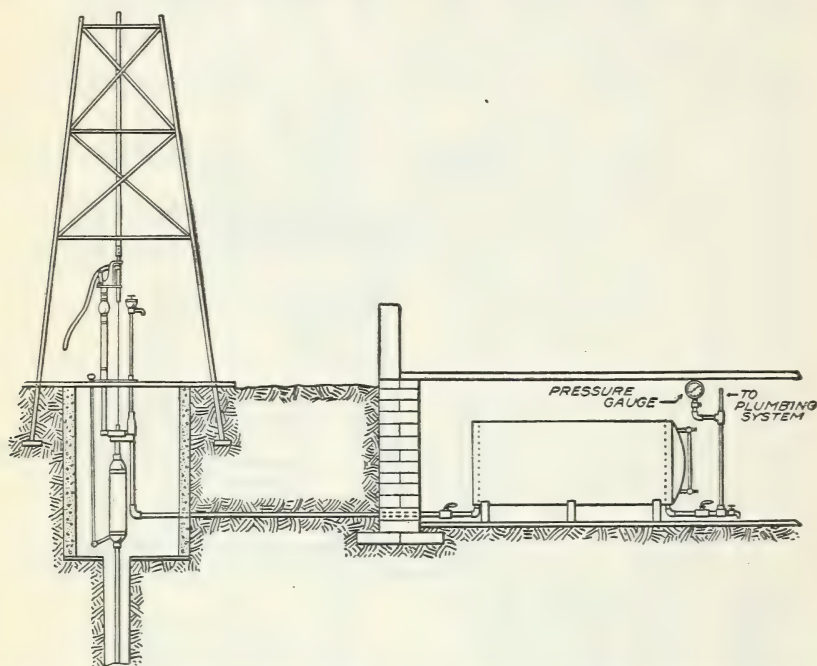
Pneumatic tank supply system with tank in basement supplied by windmill deep-well pumping outfit.
